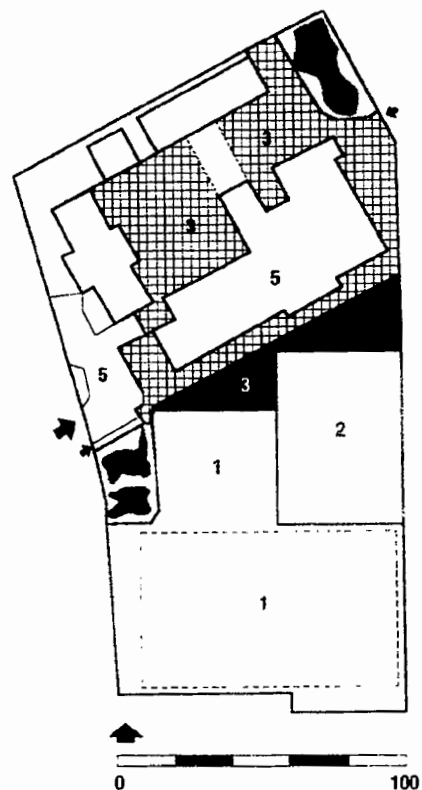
Example of an urban site layout for a 1000 place secondary school
